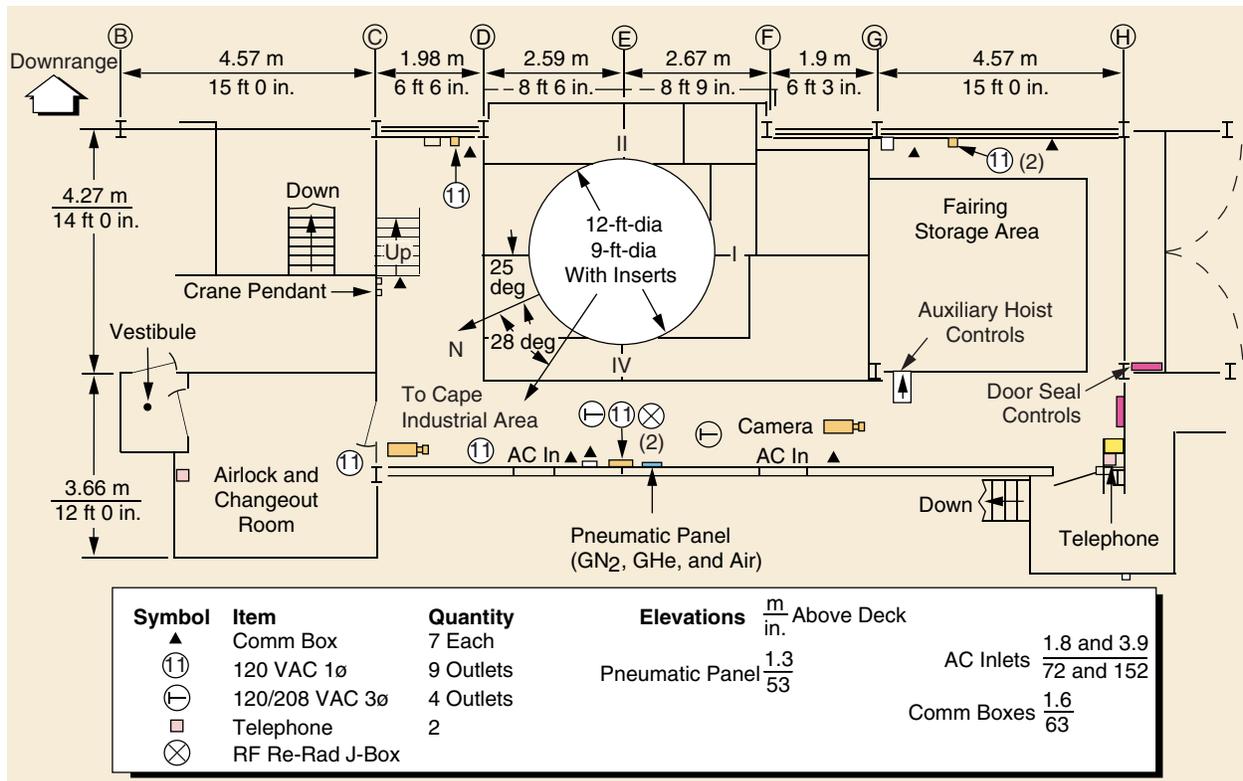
B. Level 9B Floor Plan, Pad 17B
